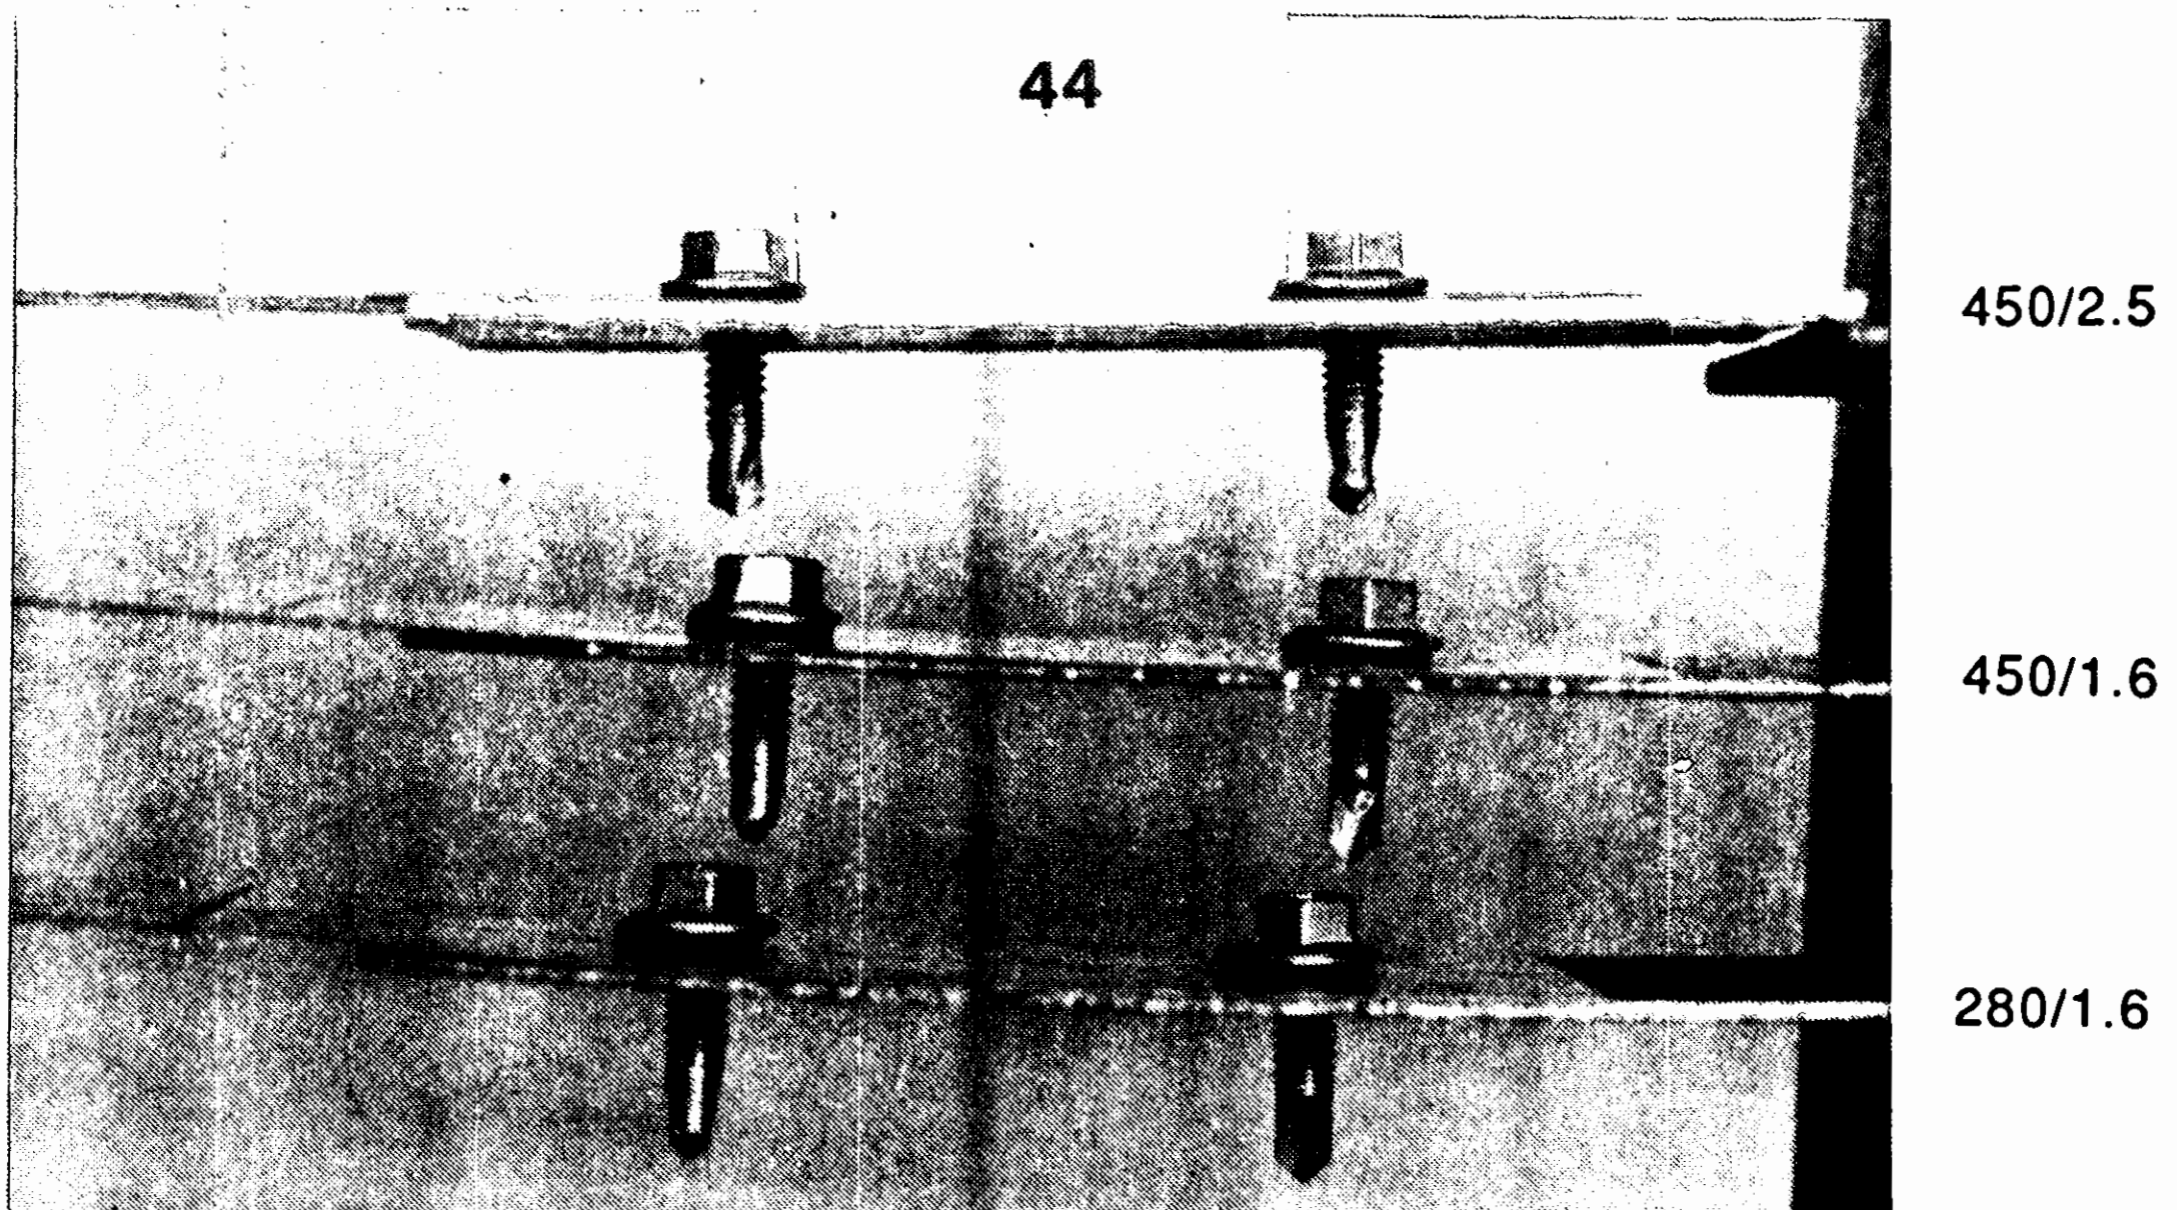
Sheet (0.40 mm)-to-purlin connections (14g neo) after shear tests.
